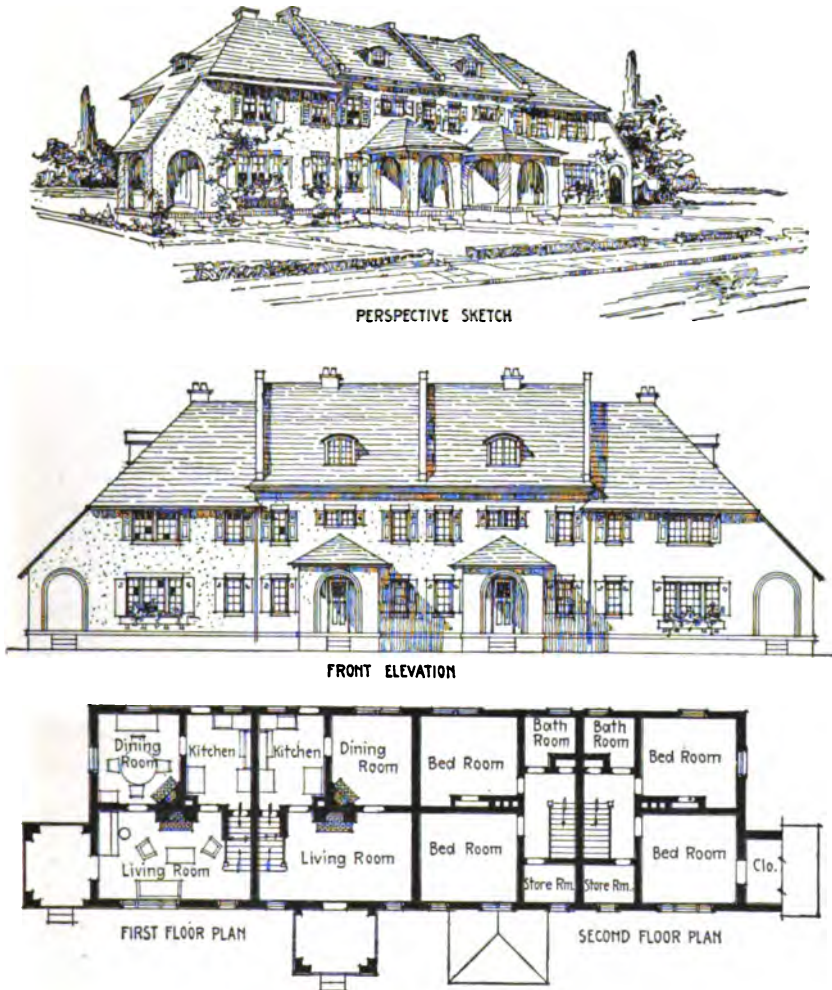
Multiple family dwellings illustrating possibilities of treatment where division walls are carried through and above the roof.
